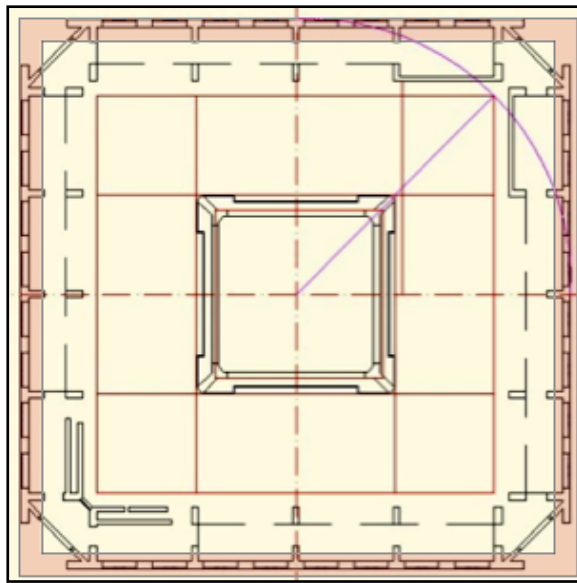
Exterior Brick Wall (Drawn by Author)
